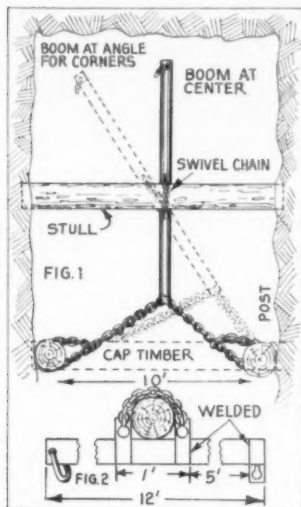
(top): Method of using shop-made boom extension for scraper loader. Fig. 2 (bottom): Side view of boom showing chain over stull
